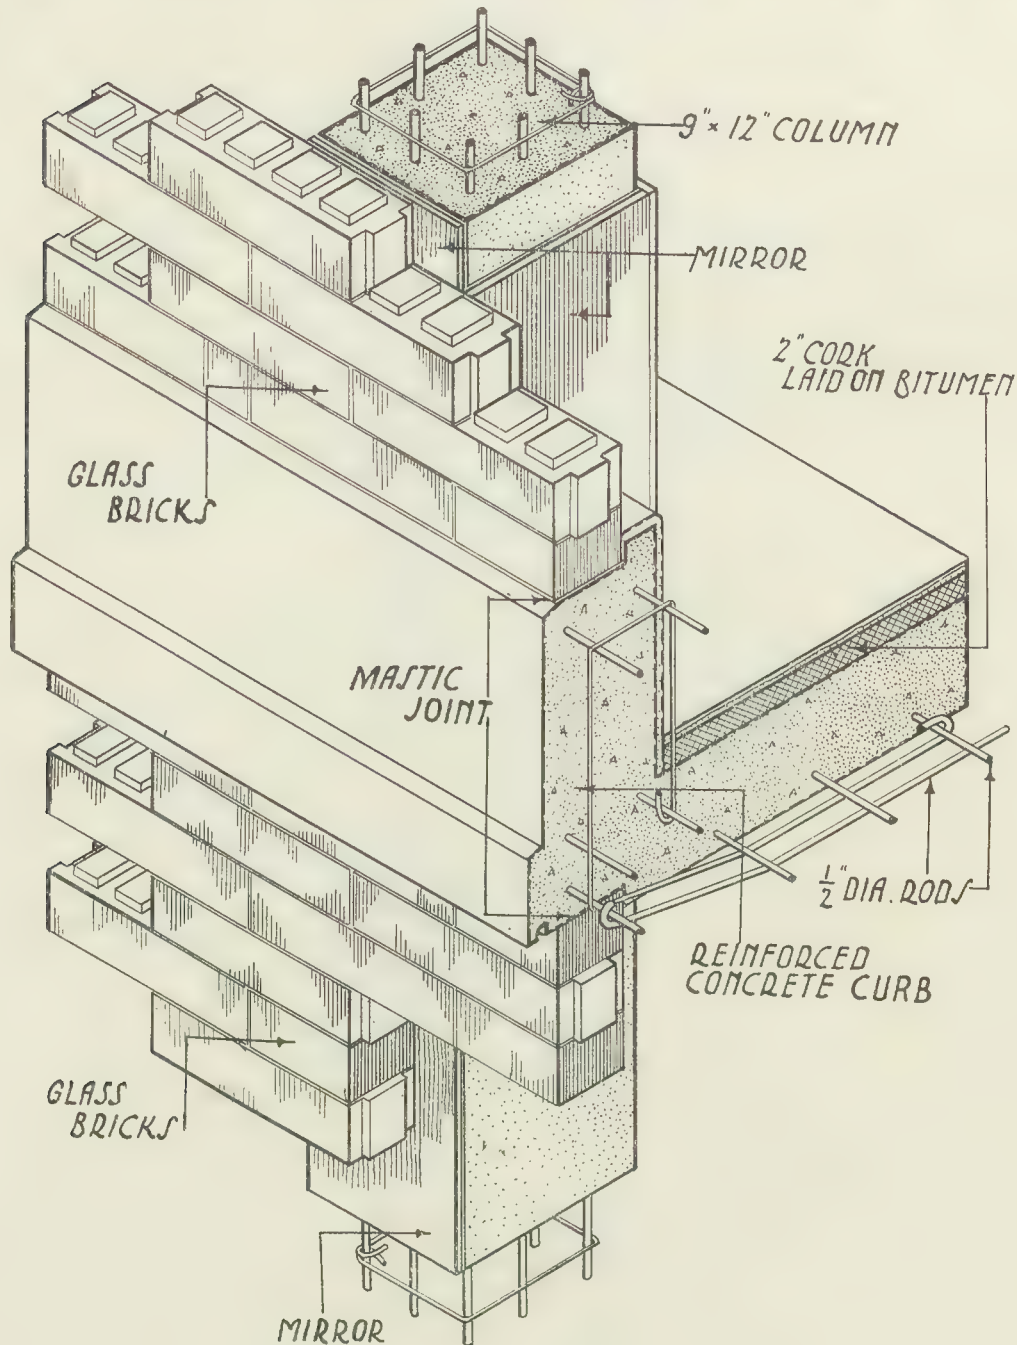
EXTERNAL WALL BUILT WITH GLASS BRICKS
